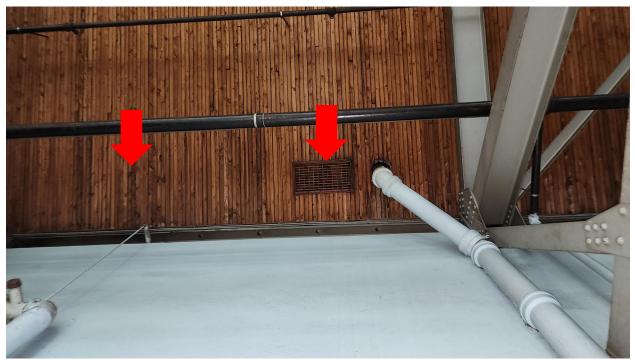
Water stains and typical opening through NLT deck (High Roof c.1951).
